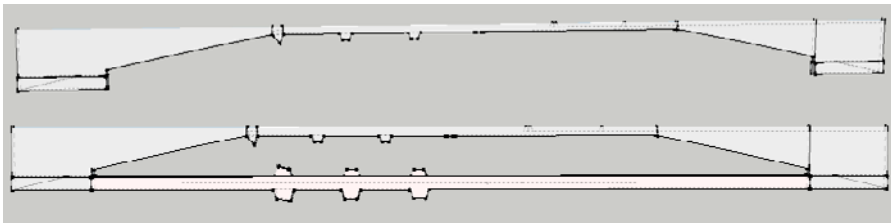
Stage 2. Connecting tie member to girder. Stages 2.1 and 2.2
